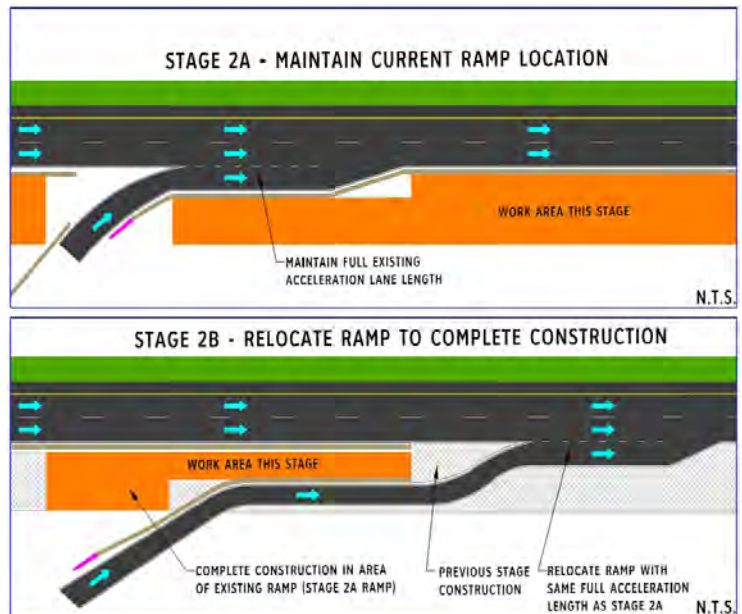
Reconstruction Sub-Staging To Maintain Ramp Movements
